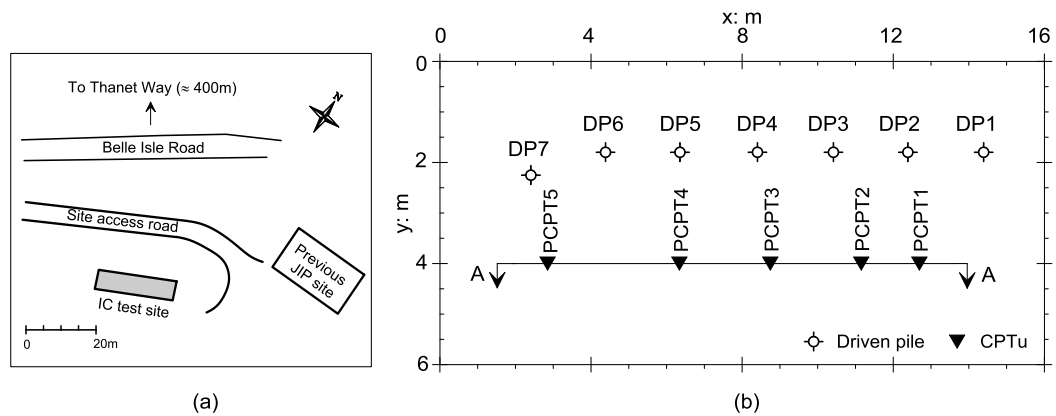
a) overall location of previous JIP site and current IC site b) plan showing layout of test piles and CPTus at the IC test site
